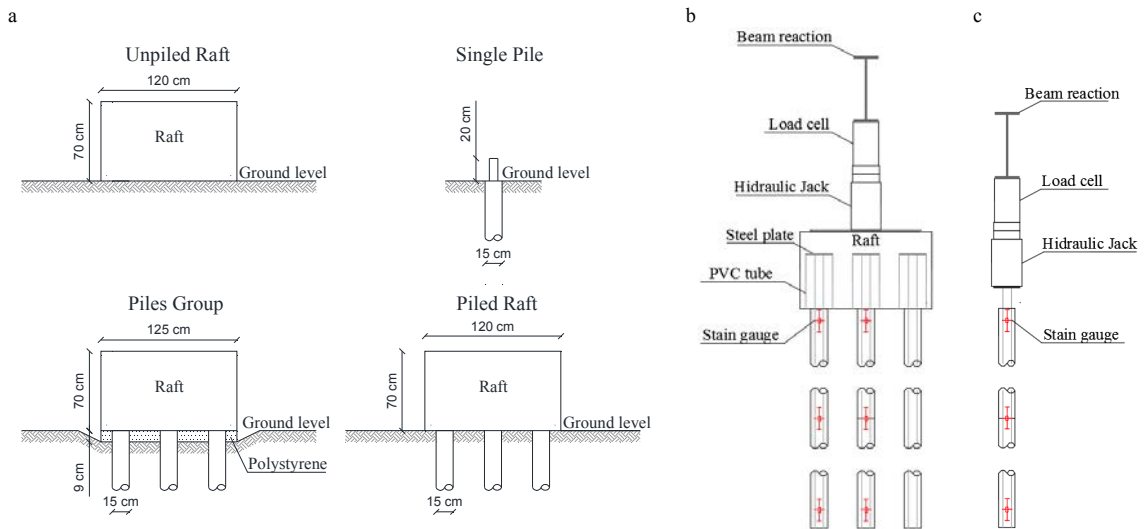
(a) Types of foundation, (b) Instrumentation scheme of pile group, piled raft, (c) single pile.
